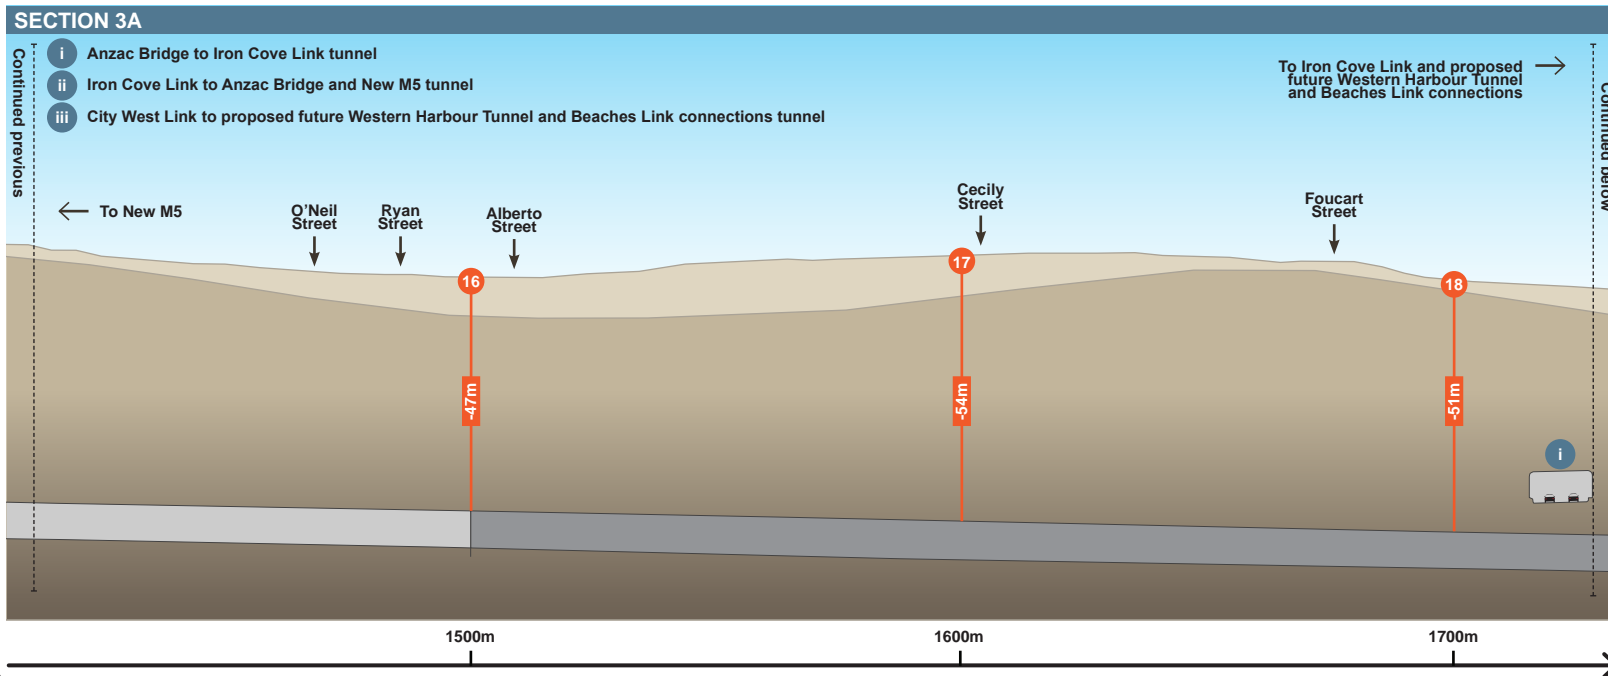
Geological long-section - New M5 to the proposed future Western Harbour Tunnel and Beaches Link connections tunnel extent - Section 3
